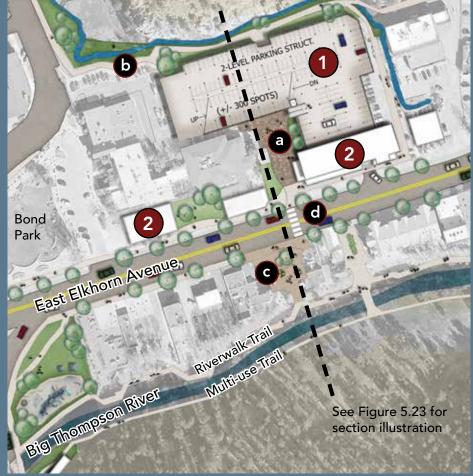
Town Hall Site Concept Plan - Alternative 1
